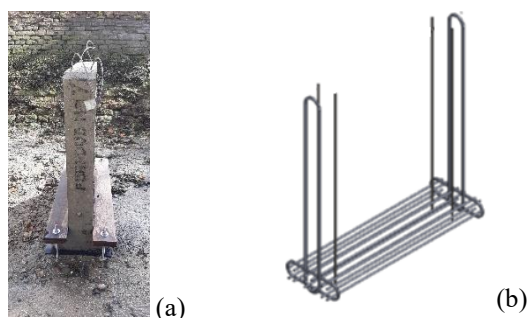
a) Reinforced concrete wall specimens, b) Rebar network.
